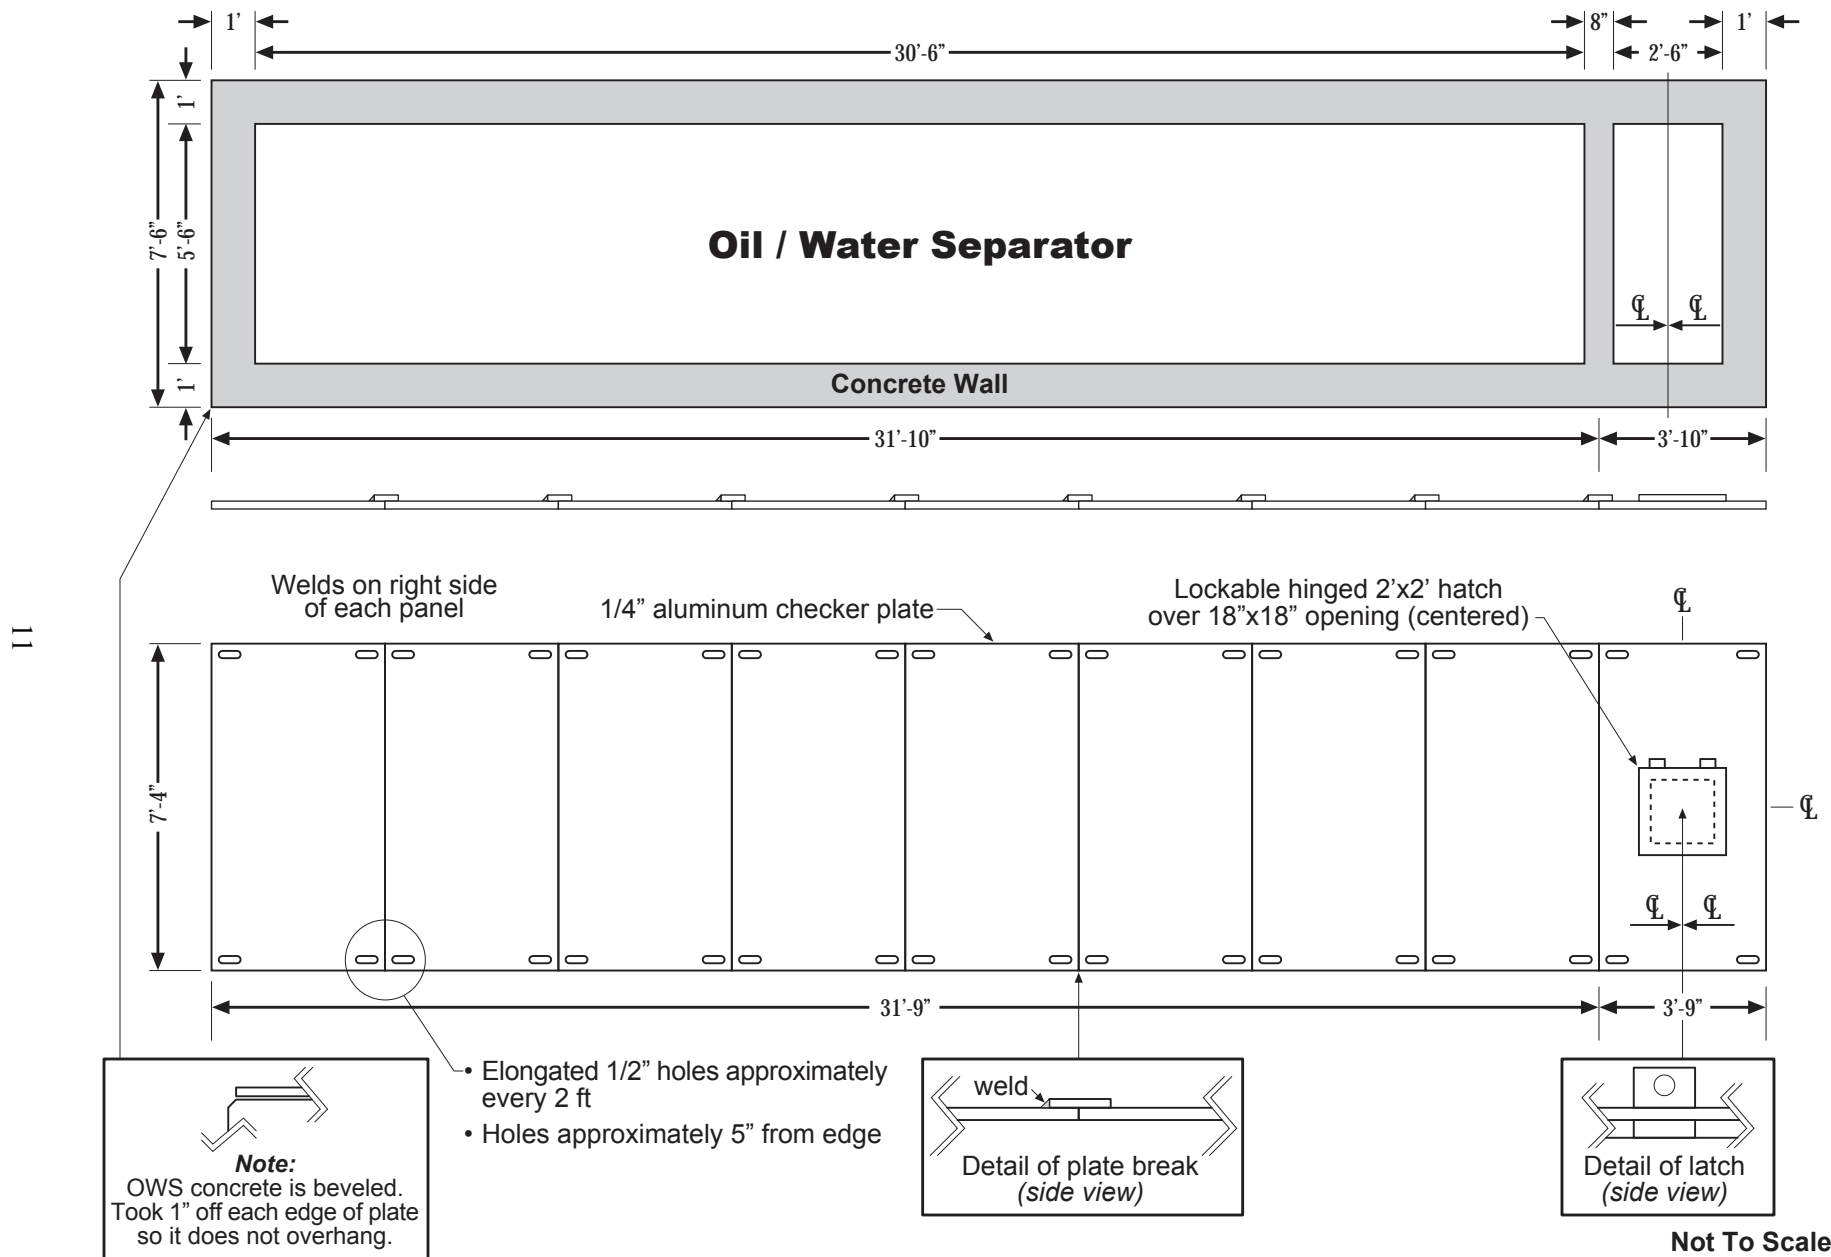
OWS Cover Installation for SWMU 27F, Northwest of Building 1340
